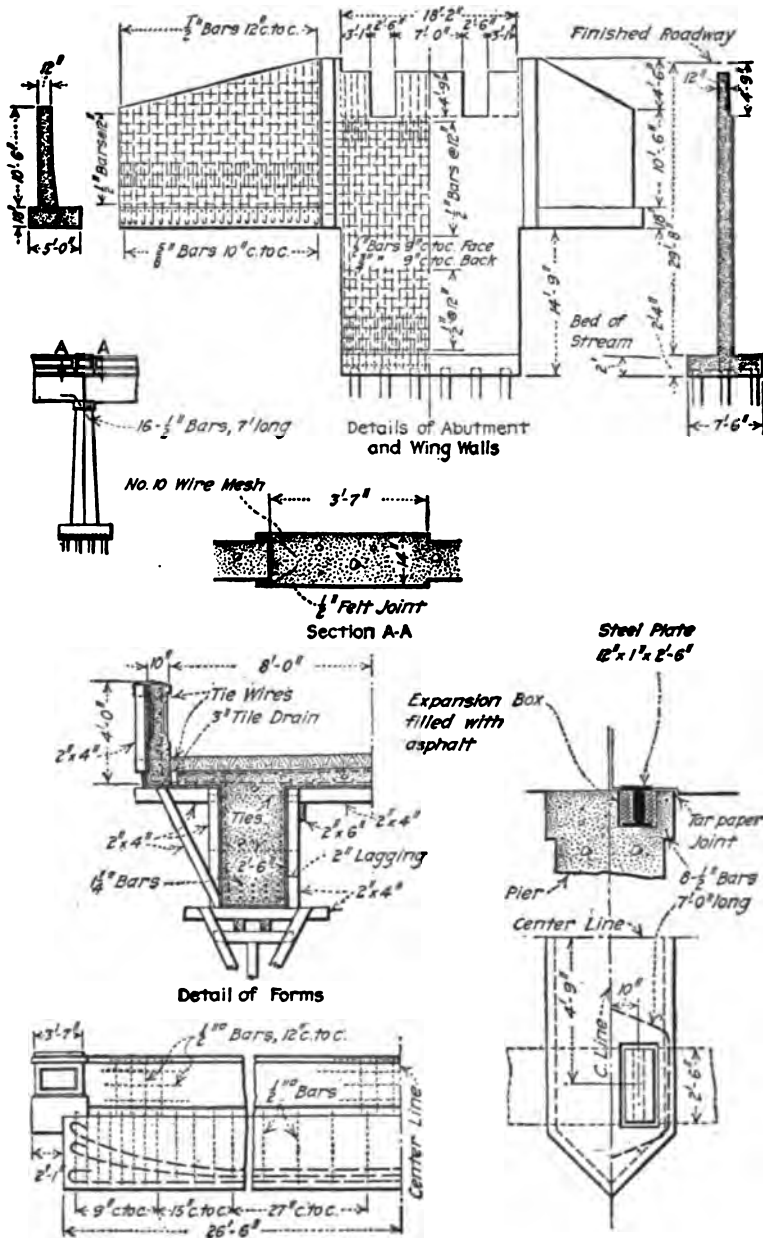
Details of Embarrass River bridge, Cumberland Co., Ill.
